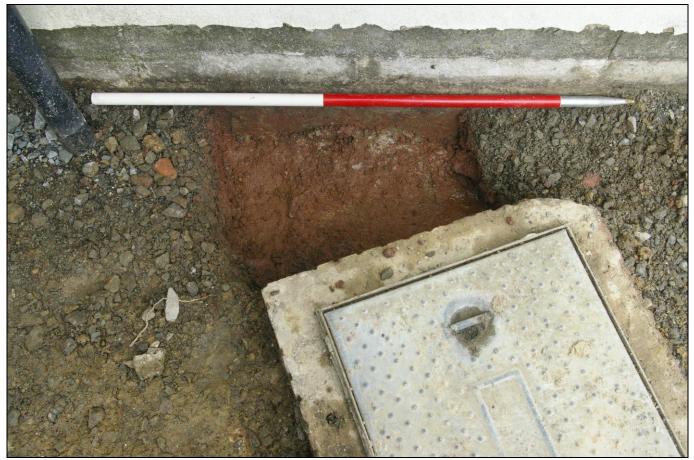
PIT 5, SHOWING DRAIN ACCESS AND CONCRETE SURFACE BELOW (101); VIEWED FROM THE SOUTH (1M SCALE).
